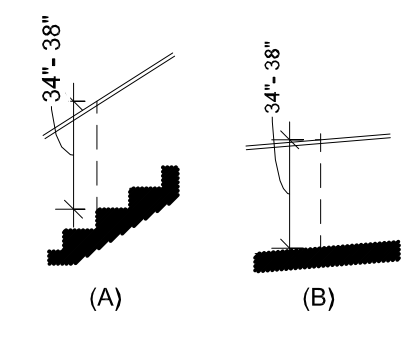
HANDRAIL HEIGHT (A) STAIRS (B) RAMP
